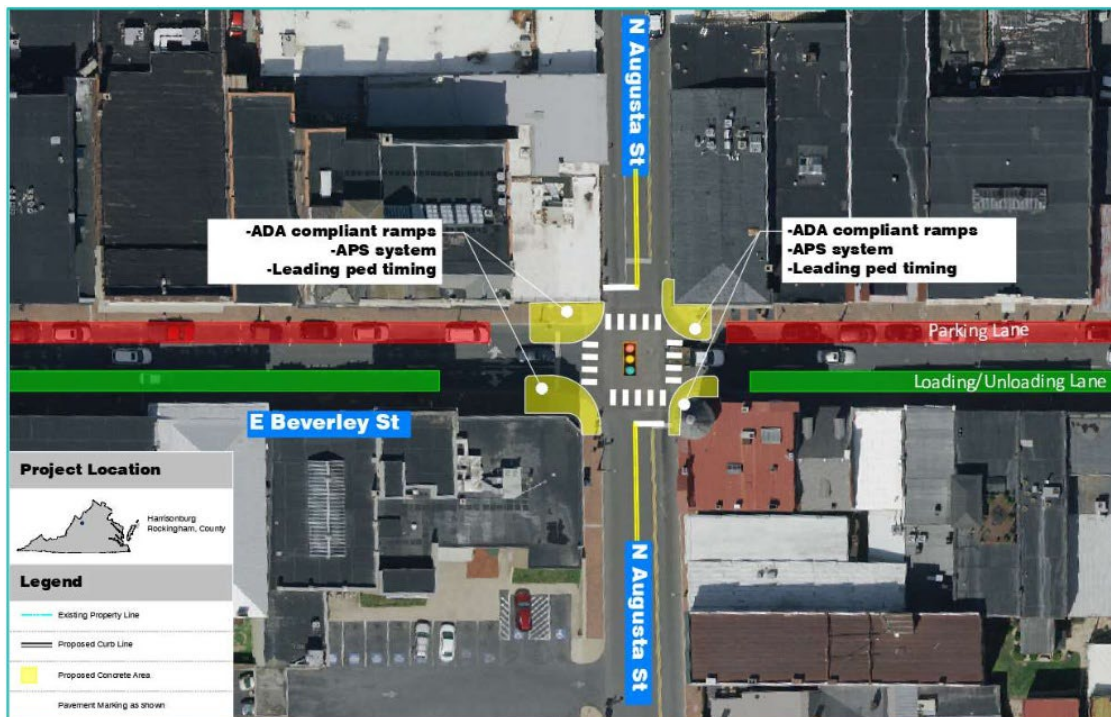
Alternative 1 Concept Sketch – West Beverly Street at Augusta Street
